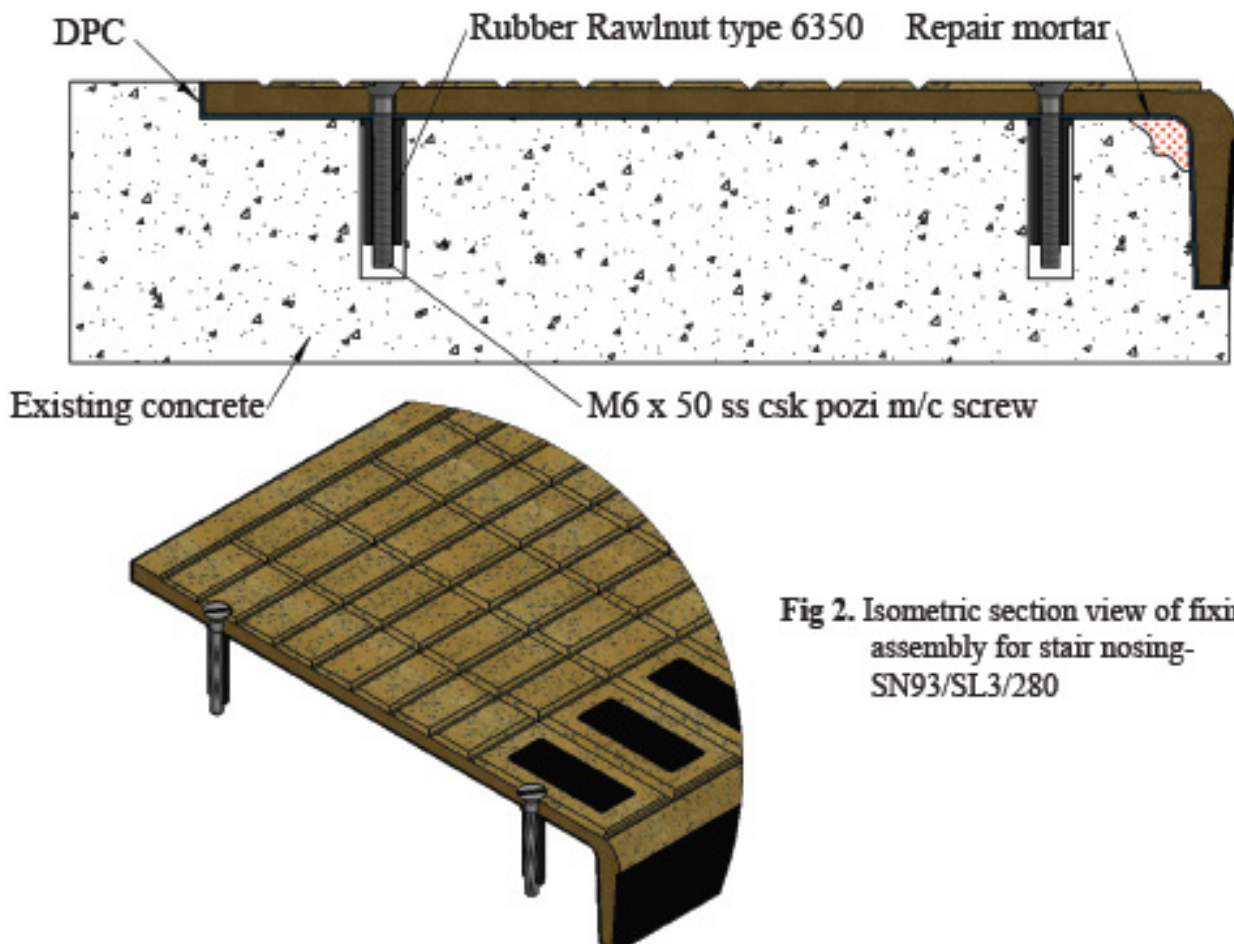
Isometric section view of fixing assembly for stair nosing- SN93/SL3/280
